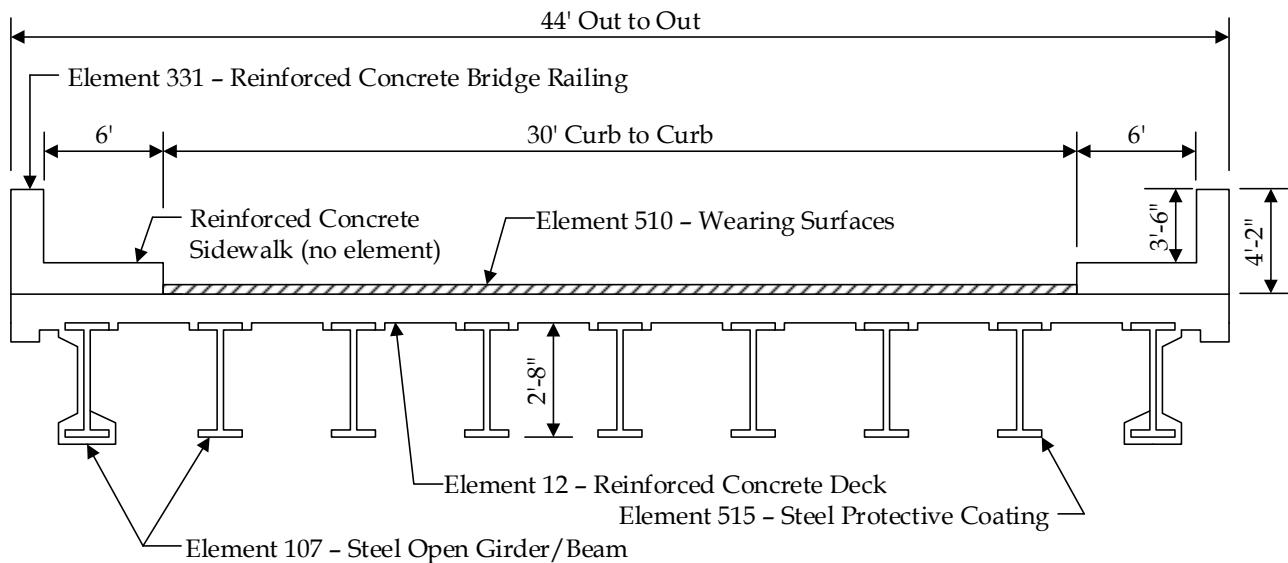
Typical Section of Steel Multi-Beam Bridge
